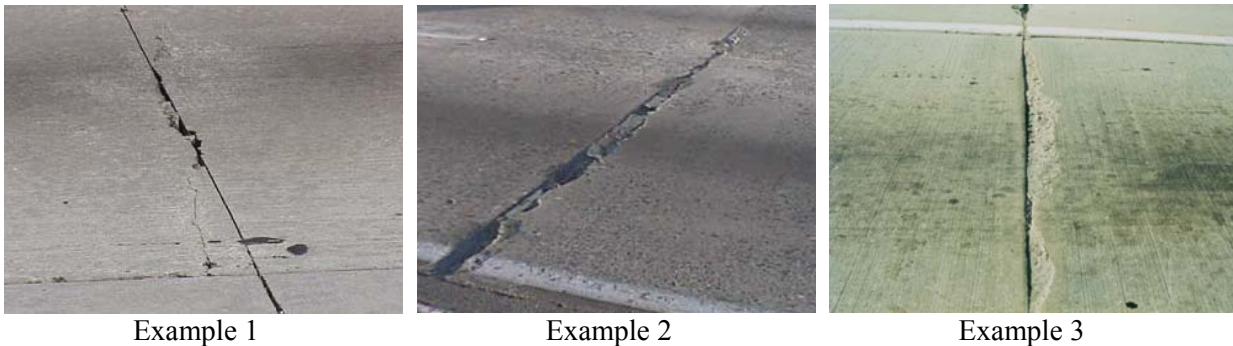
Spalling at the joint (Caltrans, 2004a)
